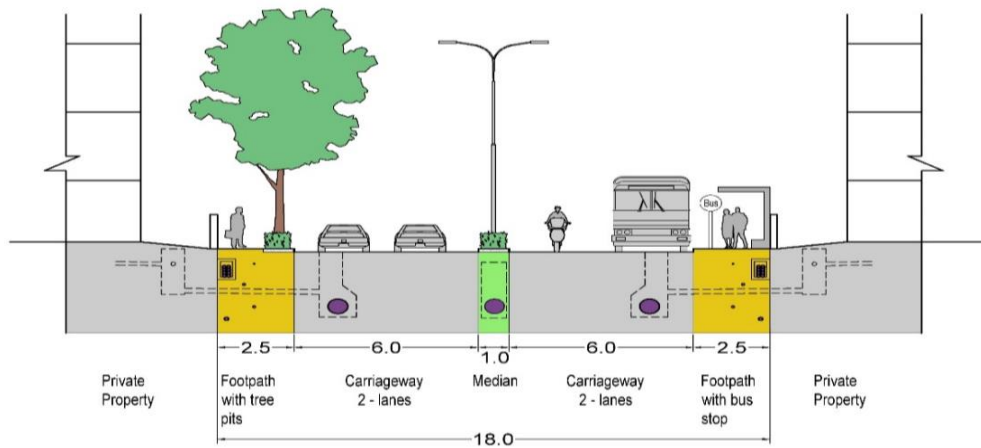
TYPICAL SECTION OF 18M WIDE ROAD
